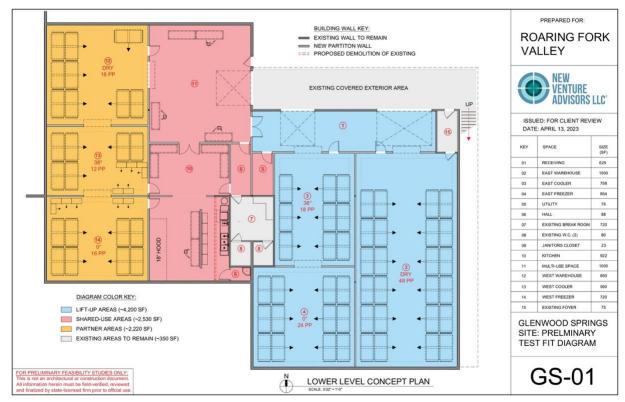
GLENWOOD SPRINGS SITE DESIGN FLOOR 1
